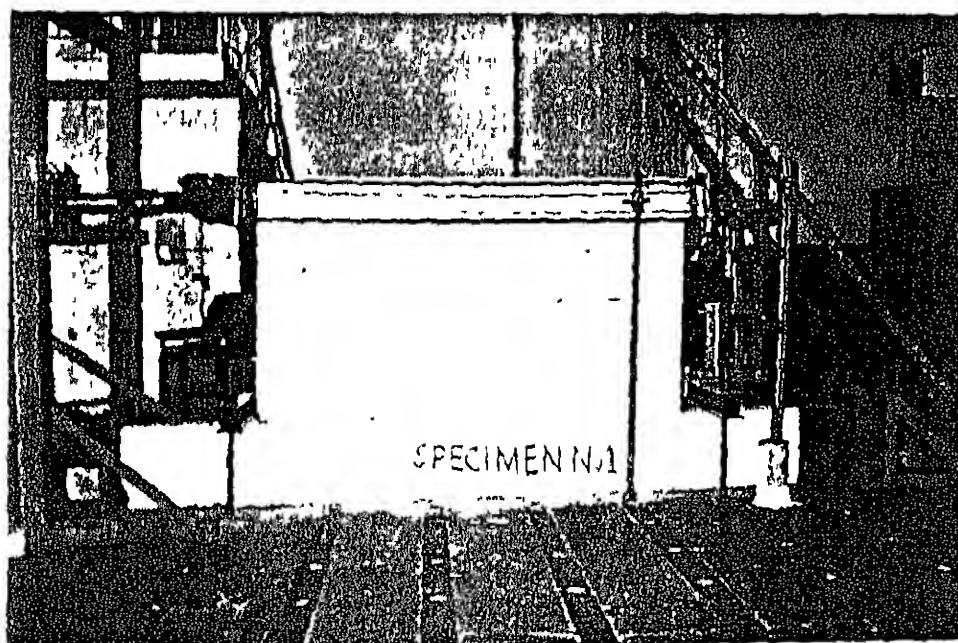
A view of the general arrangements of the specimen, the loading frame and the supports.
